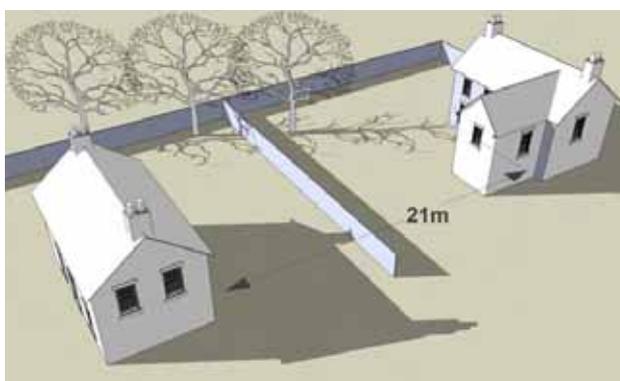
To protect privacy of occupants, 21 metres should usually be allowed between primary facing windows.
